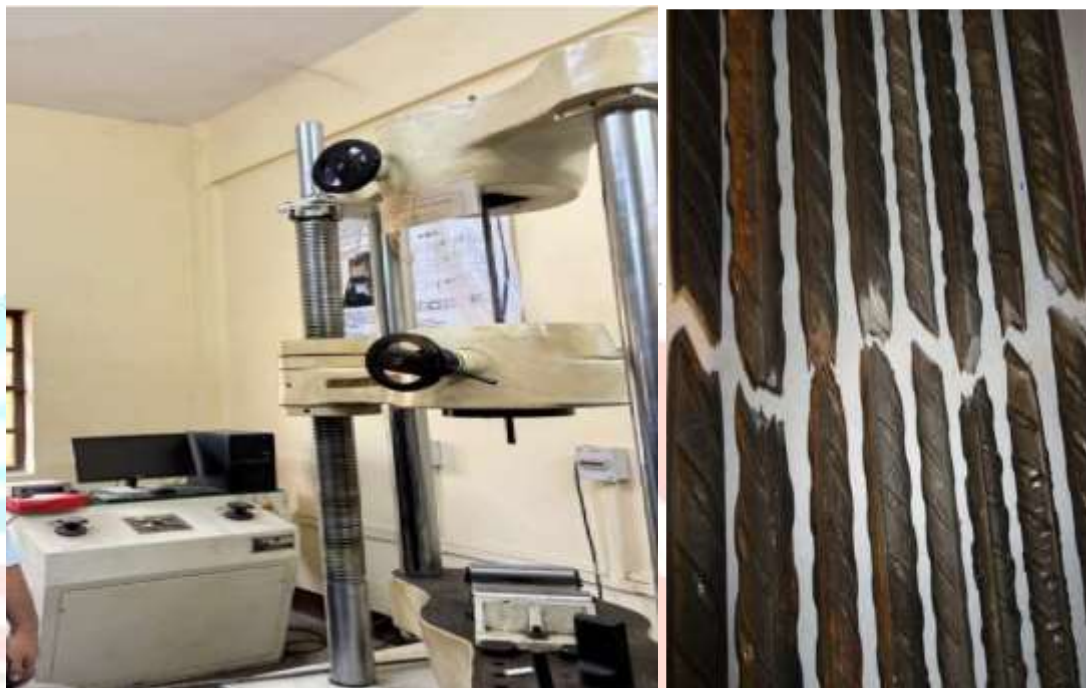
Tensile Test on TMT bar in Universal Testing Machine Fig.-3: TMT bar after Tensile Test
